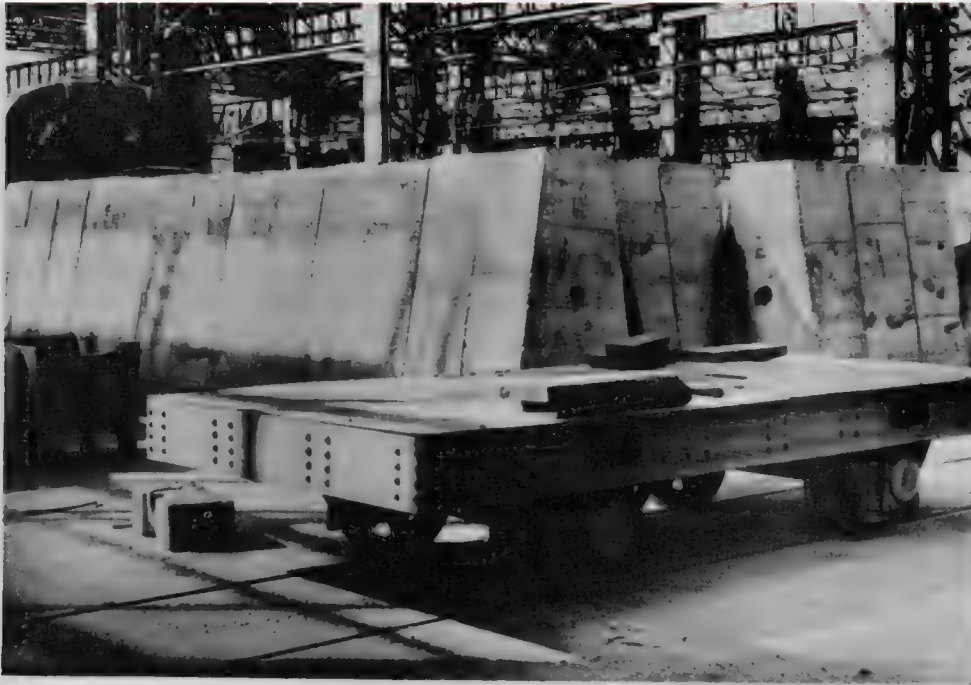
Precast, reinforced-concrete blast walls (0.85 mile from ground zero at Nagasaki).
